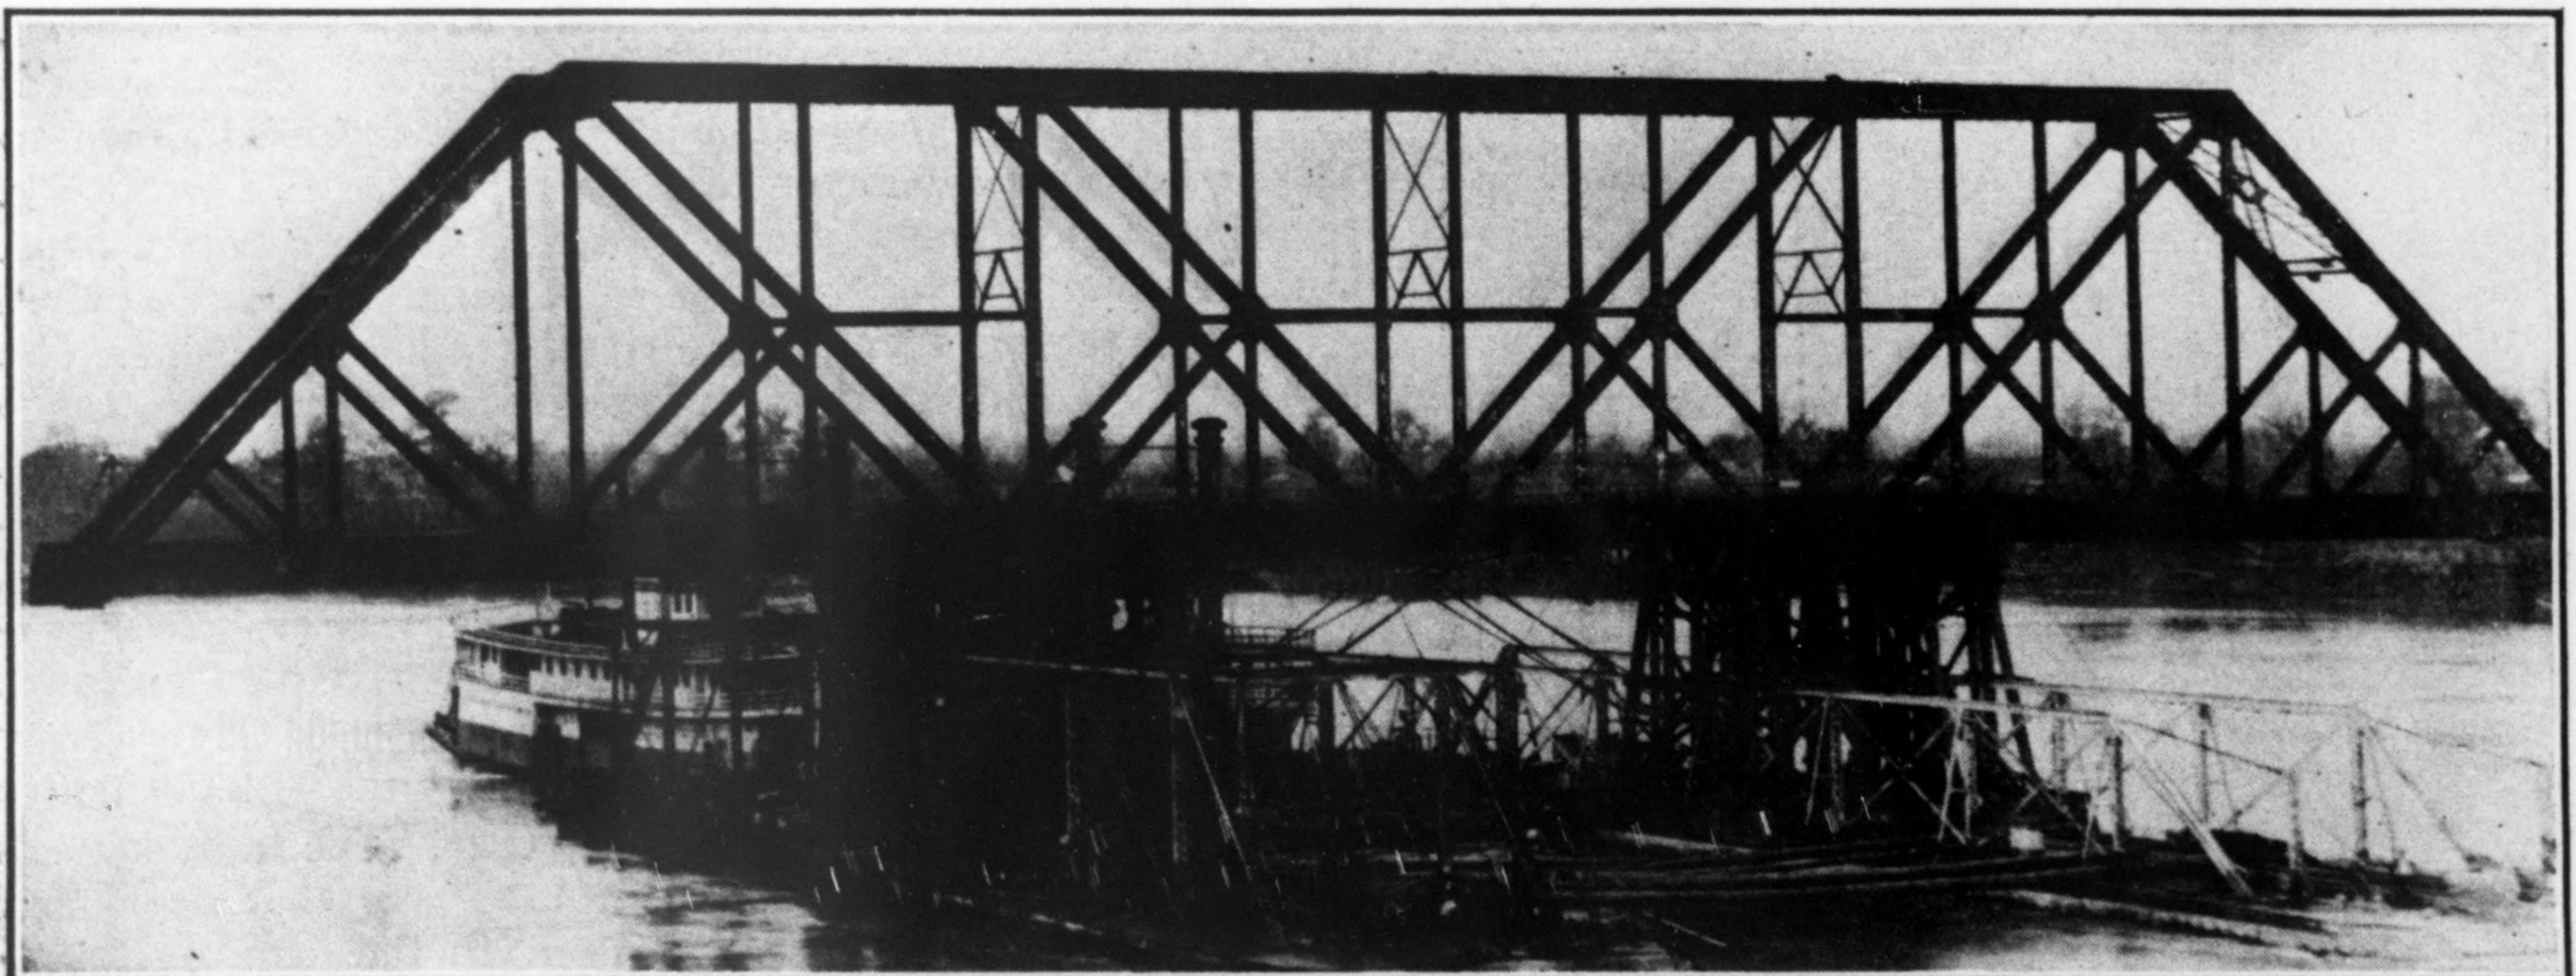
BRIDGE SPAN BEING FLOATED INTO PLACE
